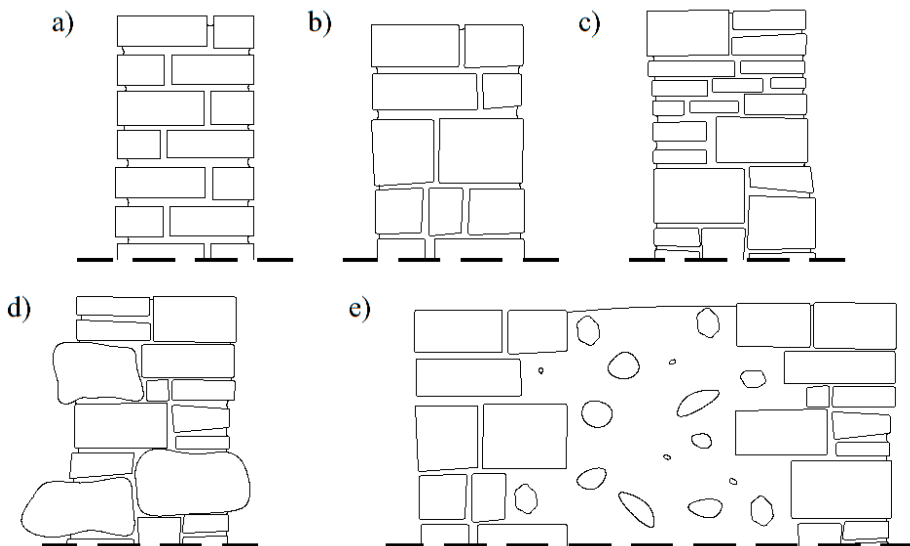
Selected types of the masonry walls in the ruins of castles – a) wall made of ceramic bricks, b) wall made of stone blows, c) wall made of stone blows with leveling layers, c) wall made of broken stones with boulders, d) the „opus empletum” wall [1]
